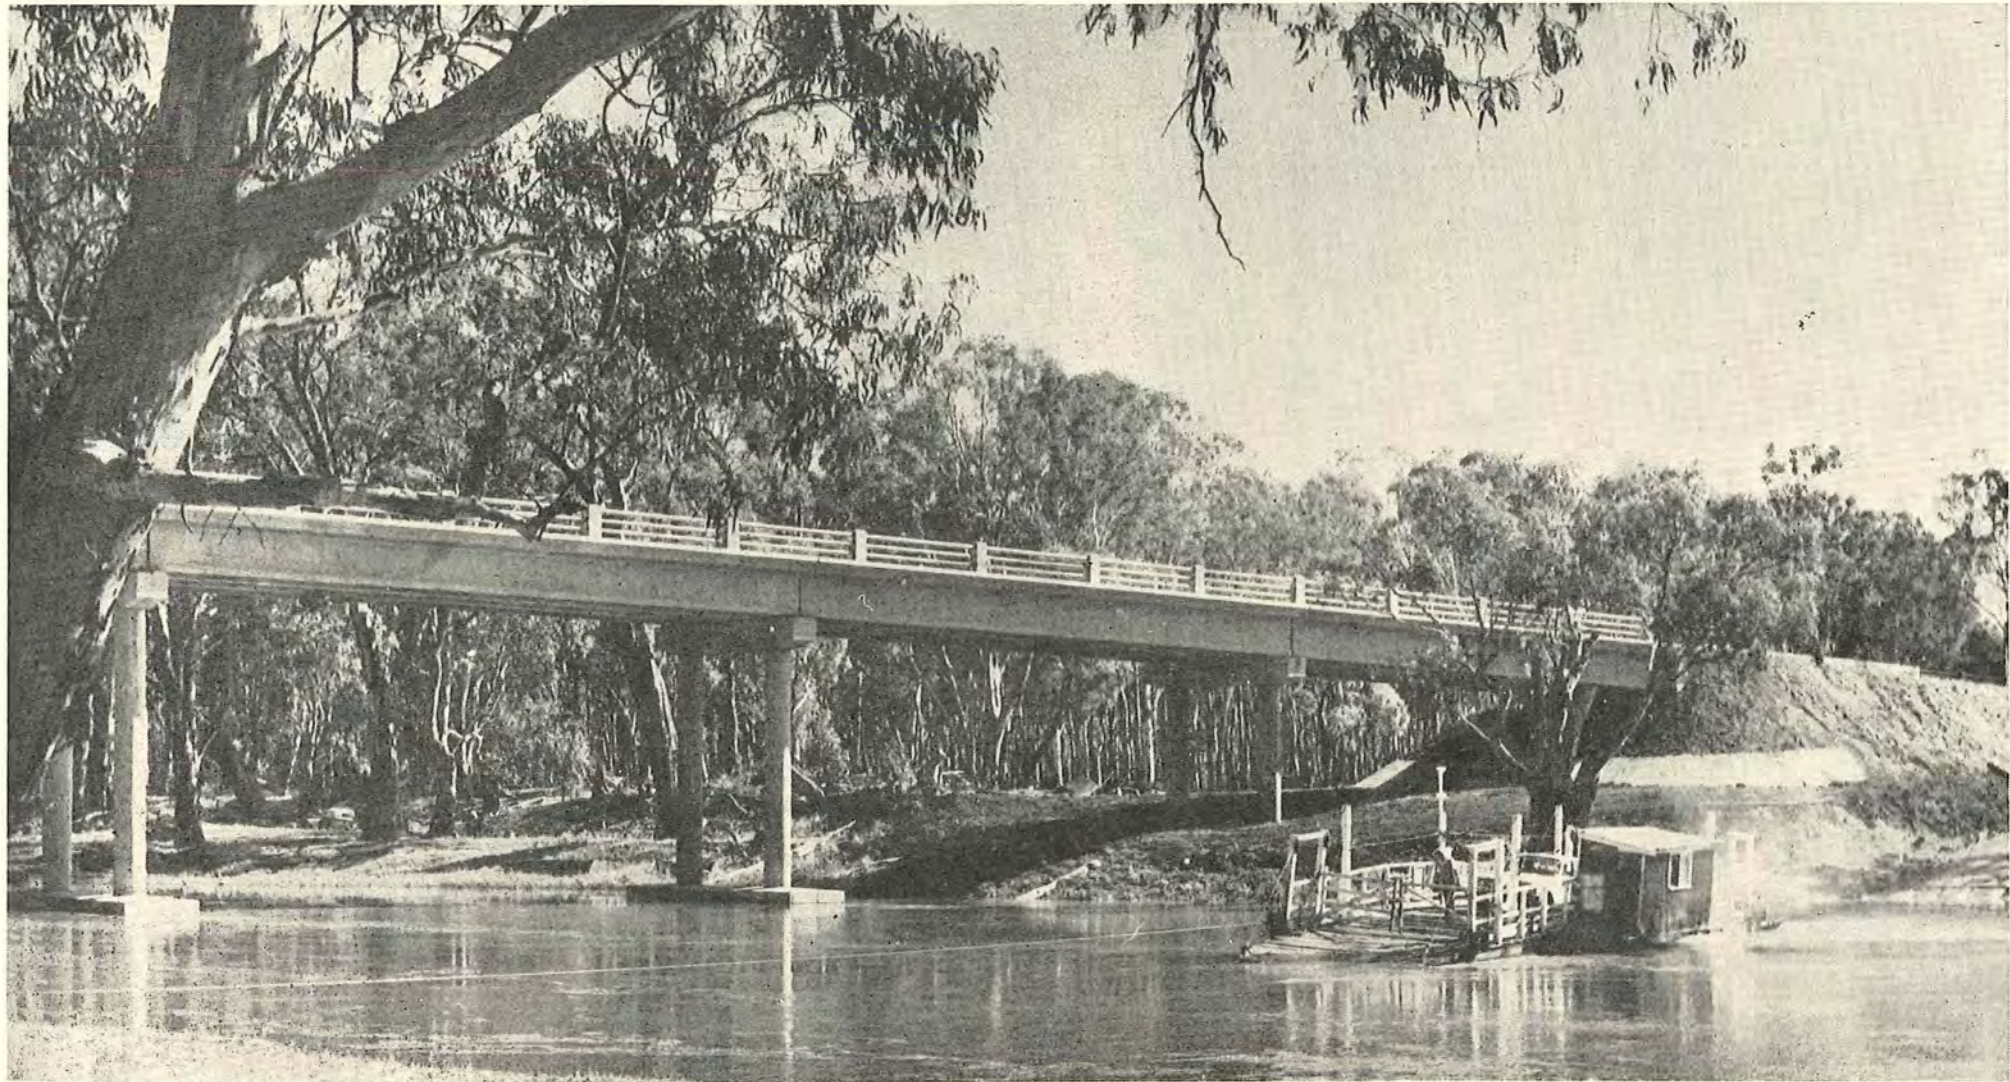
The new bridge over the Murray River at Barmah, Shire of Nathalia ; also showing the punt it replaced.
